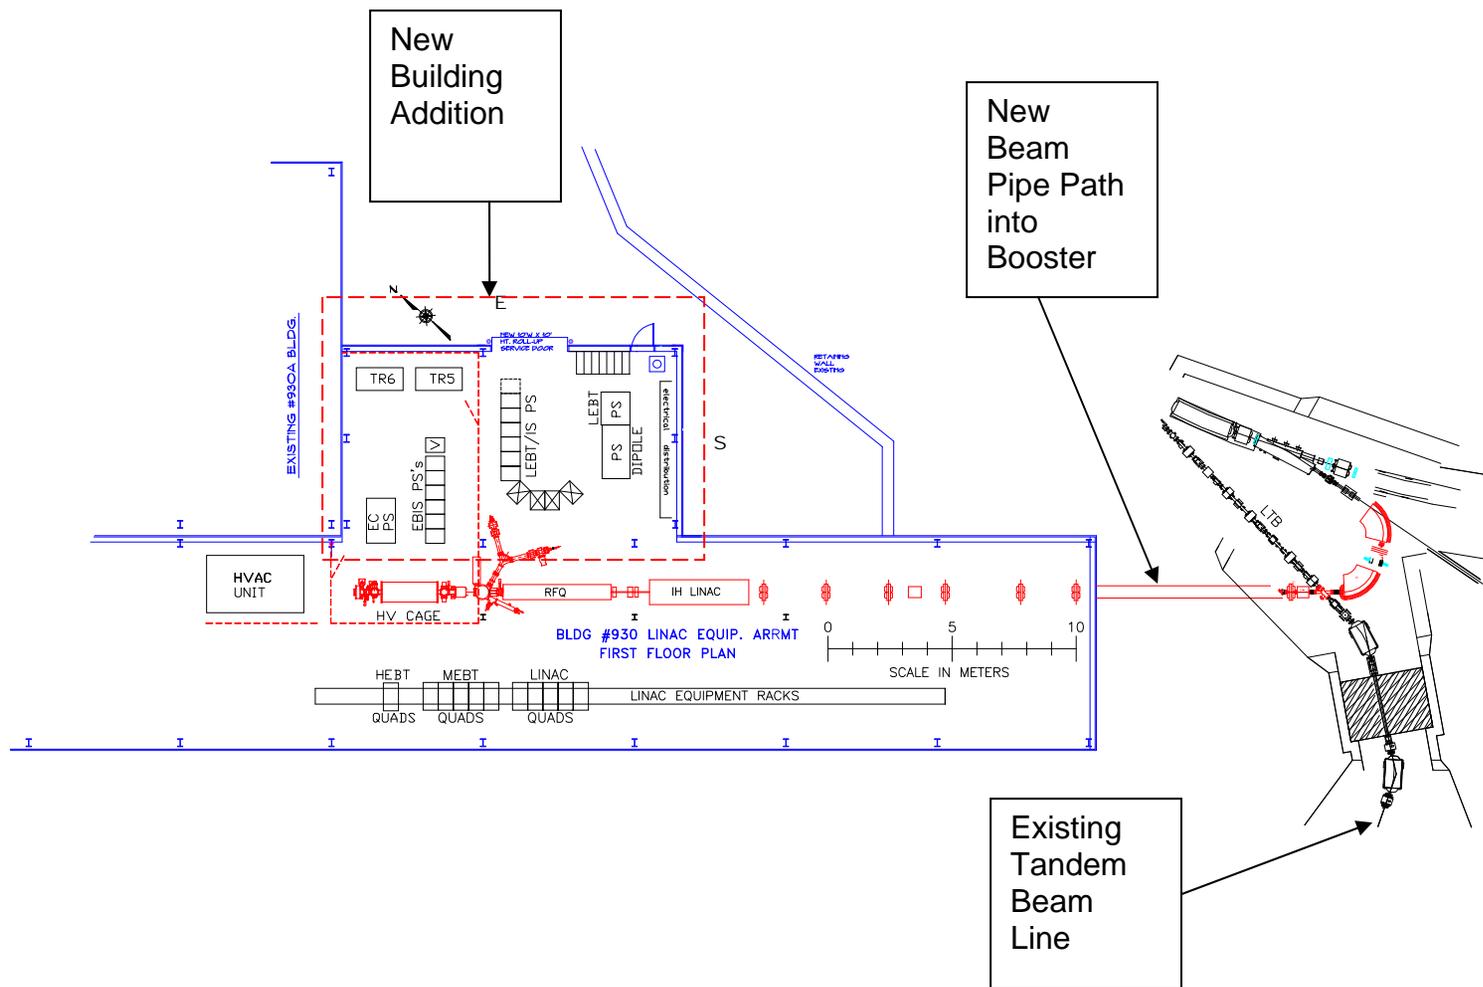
c EBIS Floor Plan in Building 930 Upper Level
